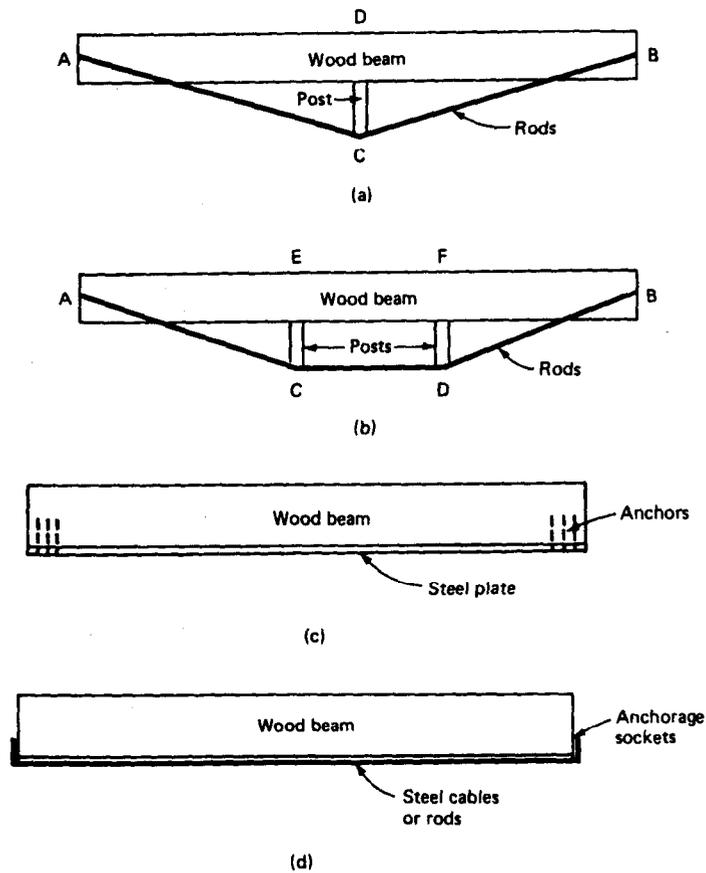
Types of composite beams. (a) King post truss; (b) queen post truss; (c) composite wood-steel beam; (d) composite wood-cables/rods beam.
